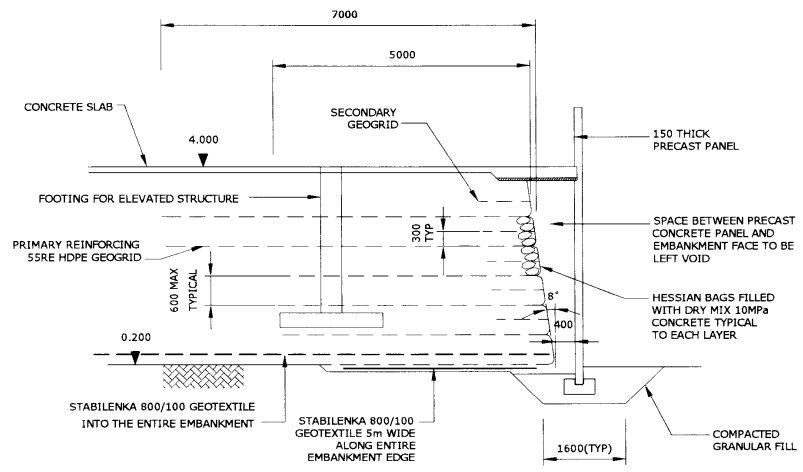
Jade Stadium Geogrid and Geotextile Reinforced Embankment Rear Face
